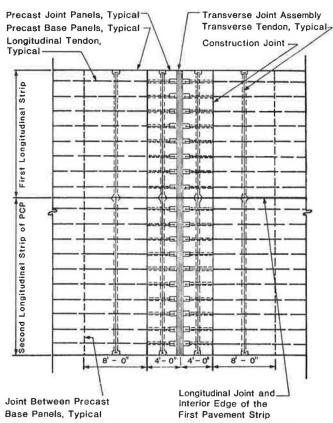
Composite prestressed concrete pavement Type I (CPCPI).
